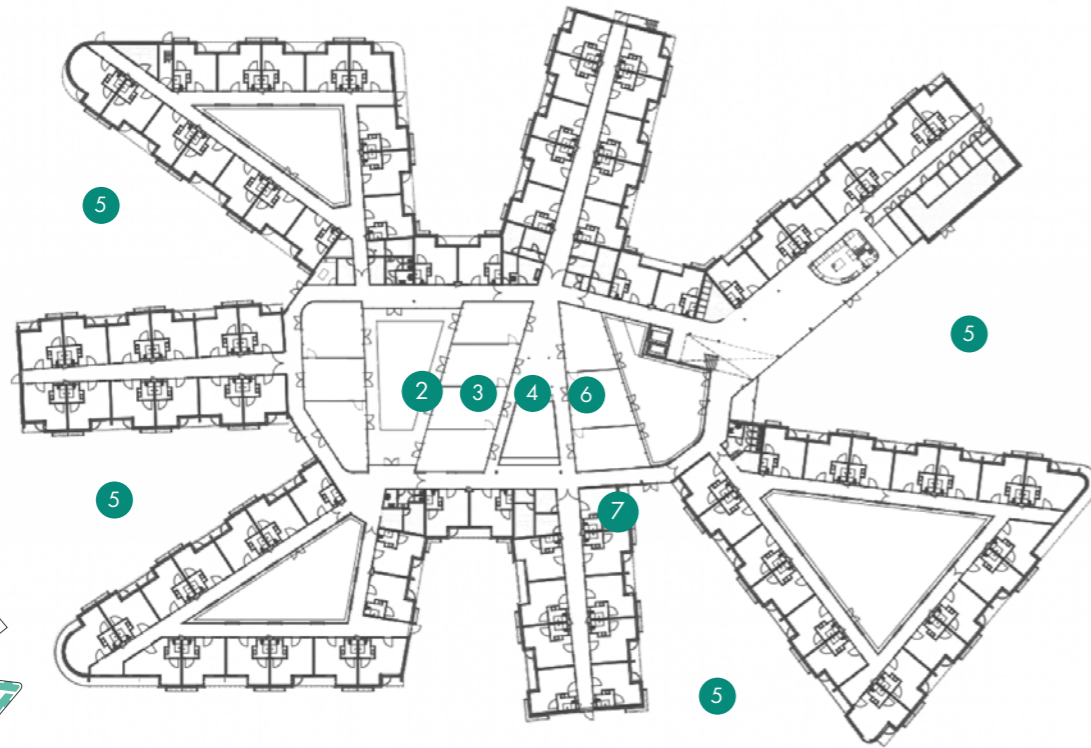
Zierik 7 ground floor plan (Scale - 1:1000).
